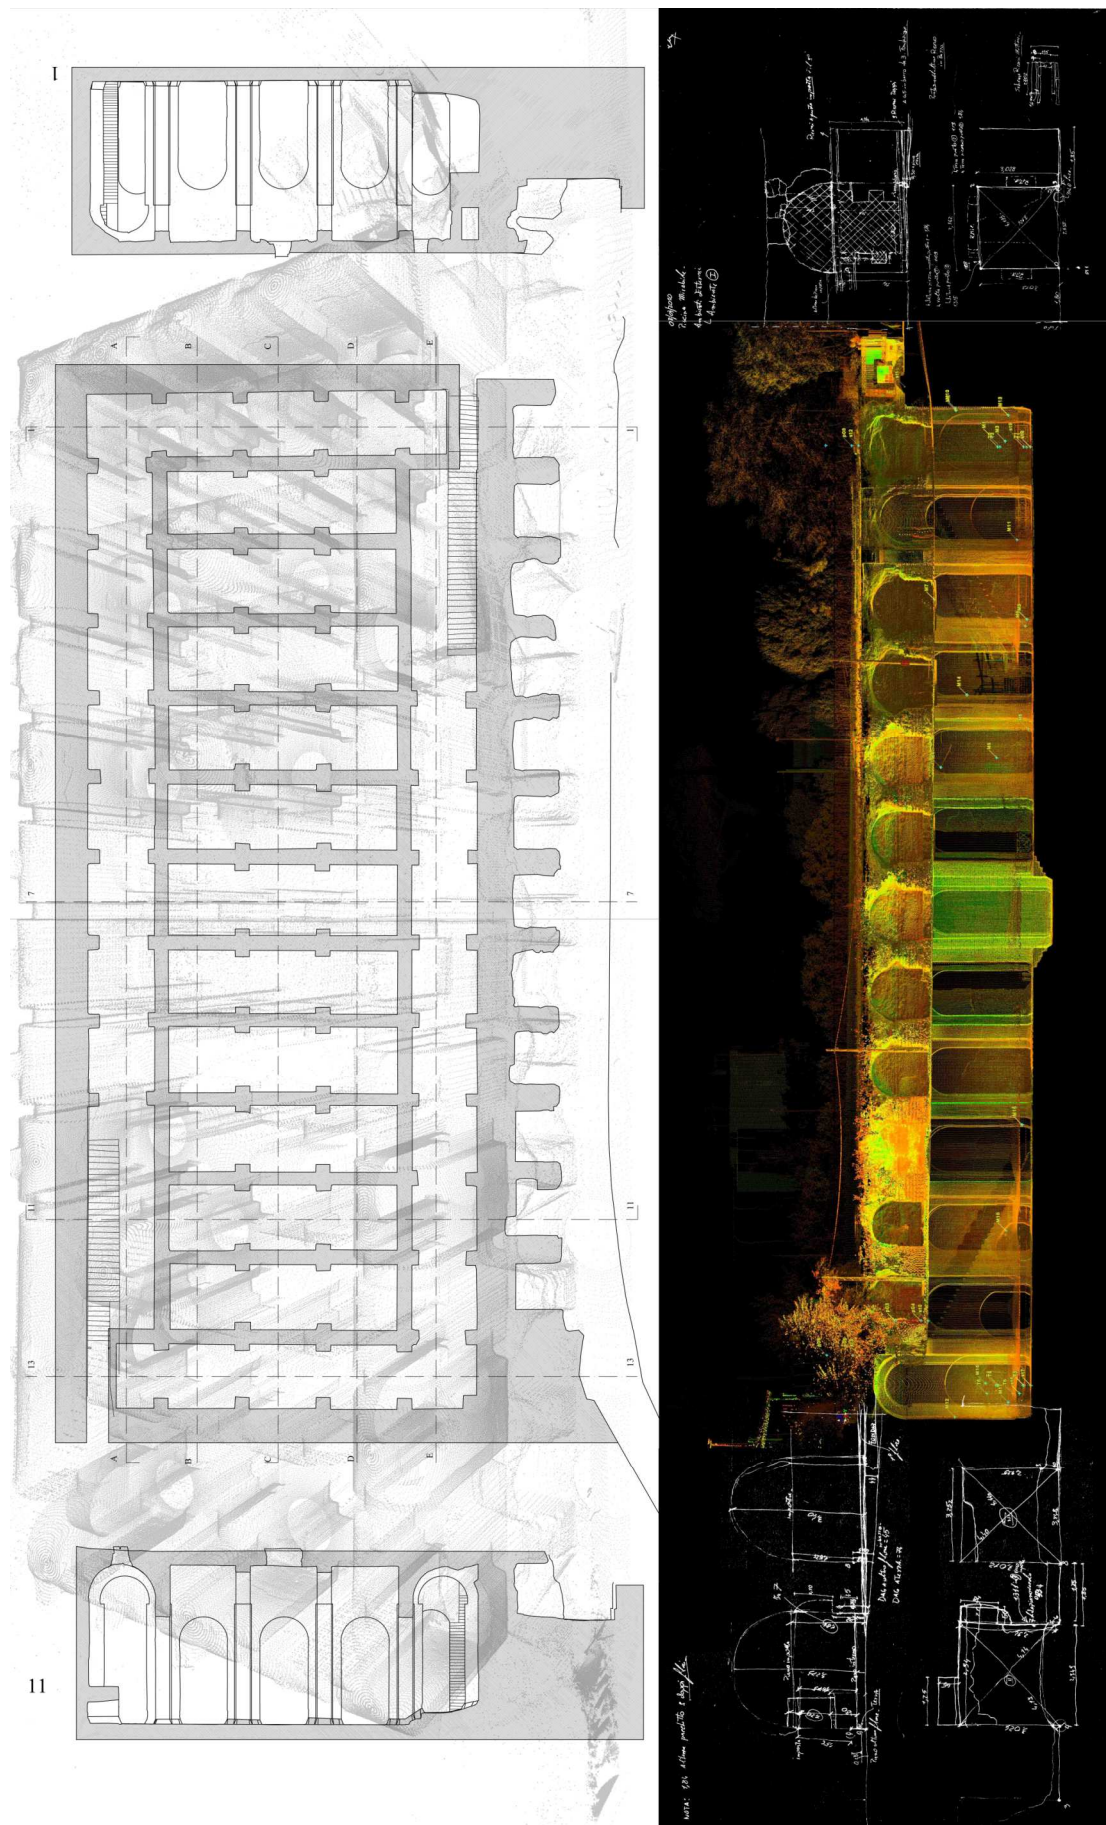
Plan of Piscina Mirabilis at 8 m from lower floor
